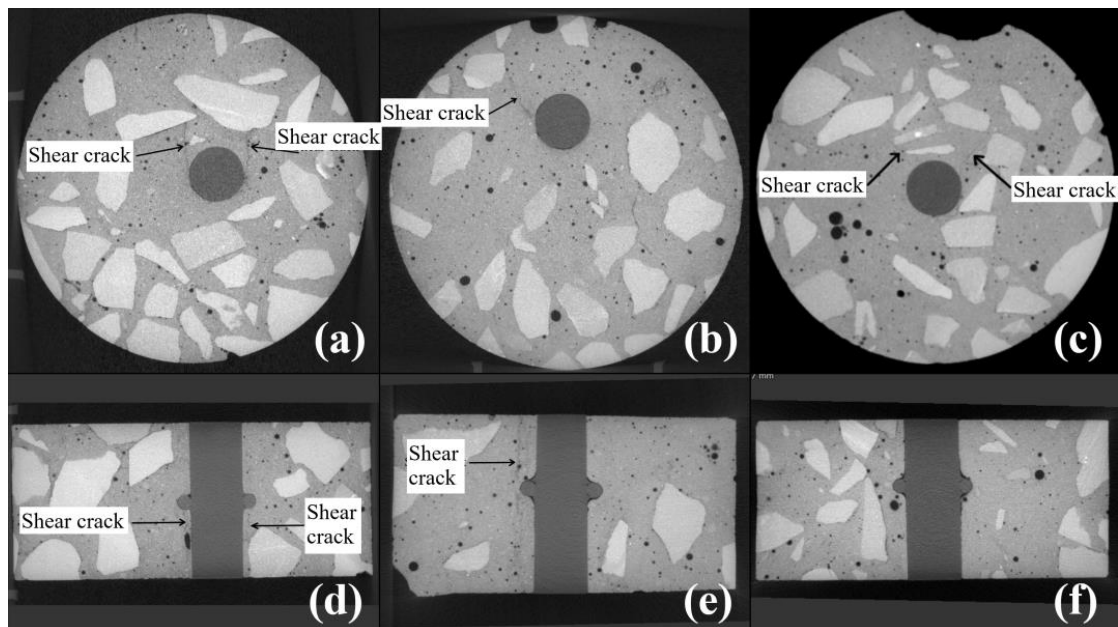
CT scans of (a) Beam 1 - 50 mm cover front section view, (b) Beam 2 - 25 mm cover front section view, (c) Beam 2 - 50 mm cover front section view, (d) Beam 1 - 50 mm cover top section view, (e) Beam 2 - 25 mm cover top section view and (f) Beam 2 - 50 mm cover top section view
